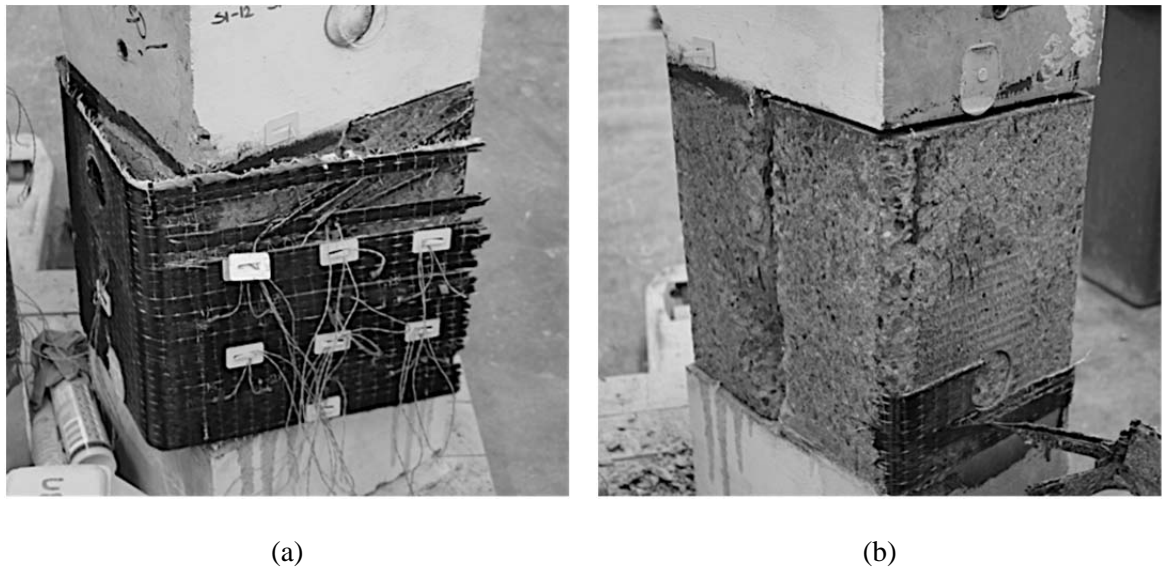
Failure modes of pre-cracked push-off specimens: (a) specimen PF2W2 after testing, (b) specimen PF2W3 after removal of the CFRP wrap.
